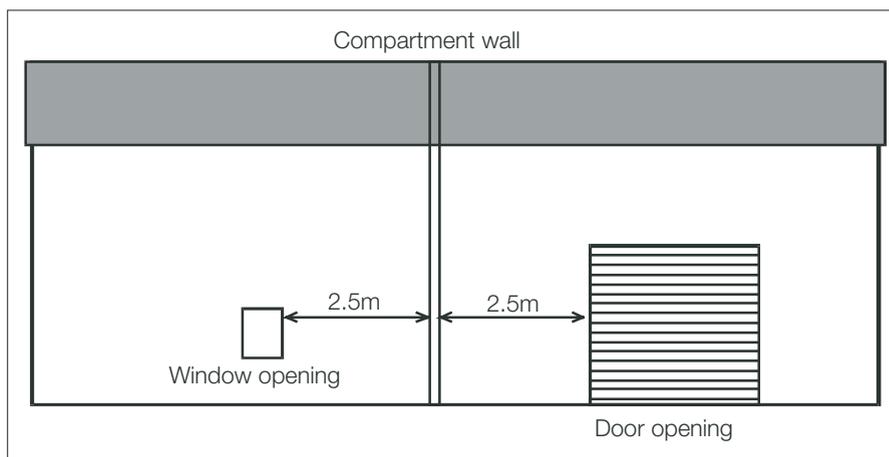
Minimum distance between unprotected openings and compartment wall
